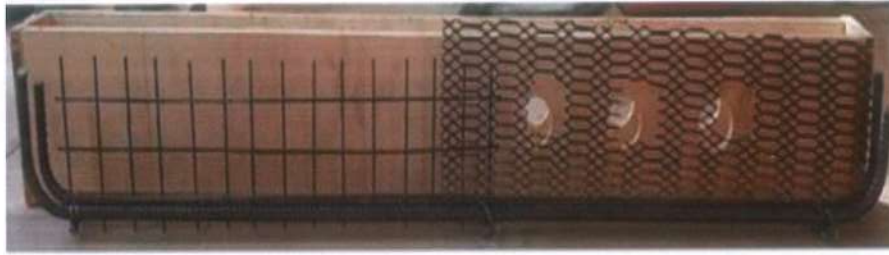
Reinforced Concrete Beam with Expanded Mesh [33].
